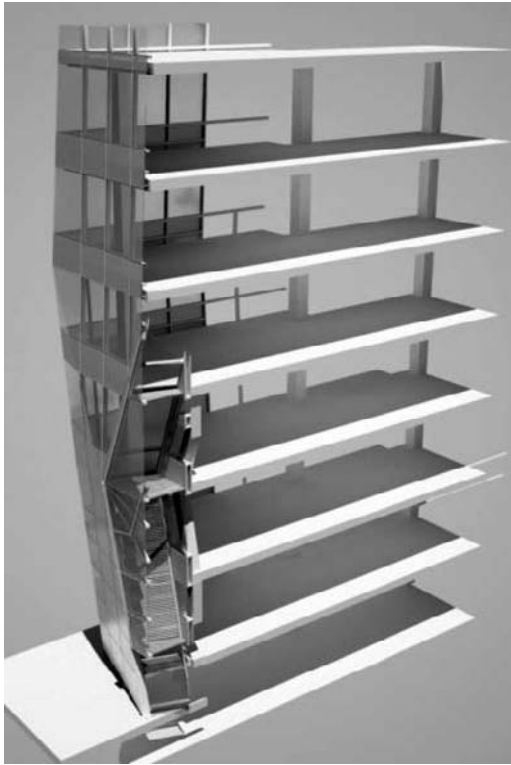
At Great Ormond Street Childrens' Hospital our brief was to create a folded glass wall design including final construction details. An original wireframe model for the building was provided and input to a parametric model. Architect: Llewelyn Davies Yeang
